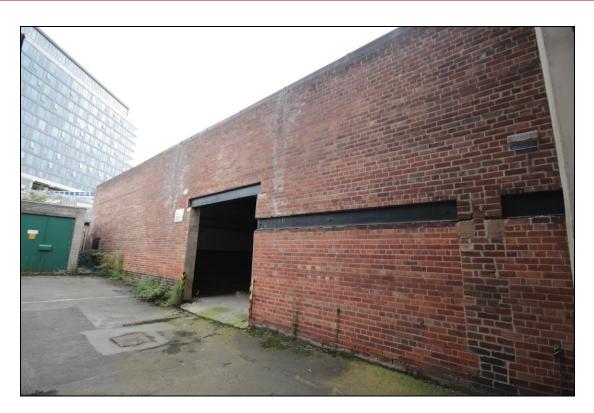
The eastern end of the north western elevation, facing south east. Scale 1m.
